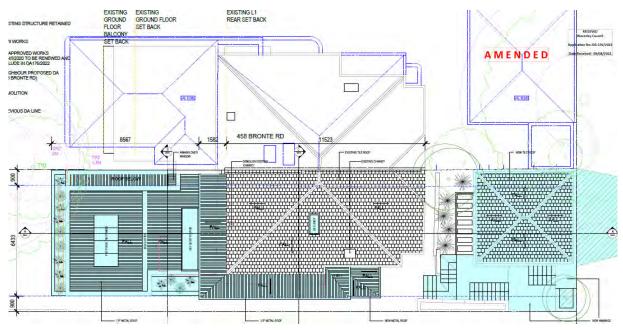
Approved roof plan of DA-176/2022 at 456 Bronte Road
